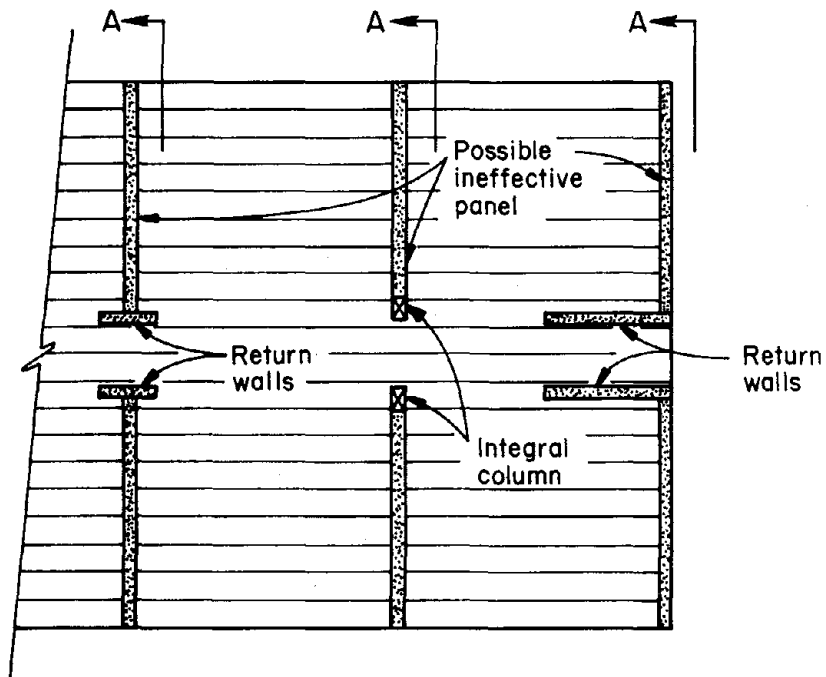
Cantilever Mode--Two Adjacent Wall Panel Stacks
